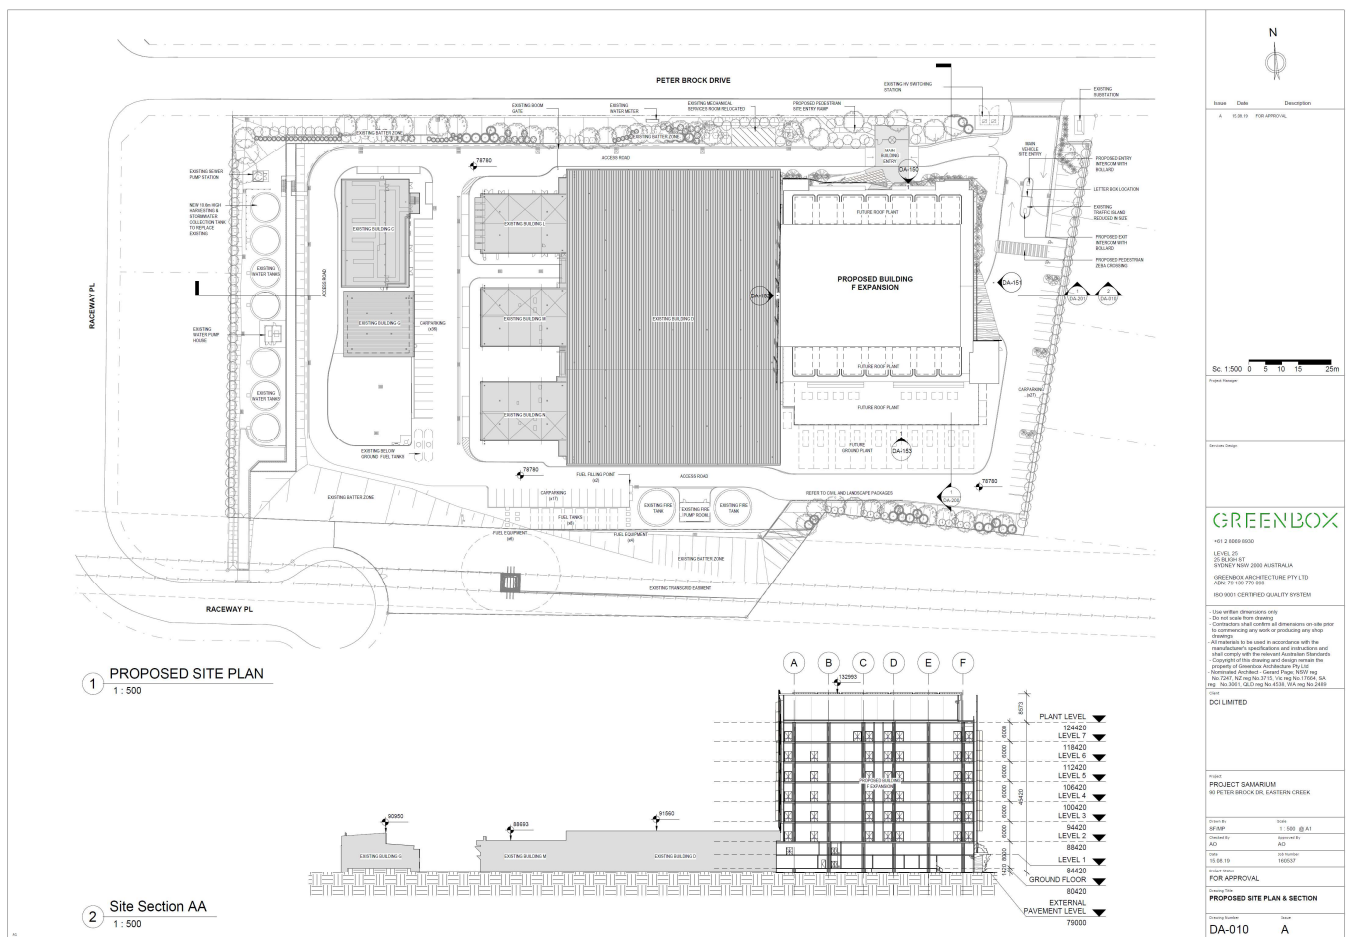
Approved SYD02 Data Centre Expansion Site Plan and Section (Source: Greenbox)
